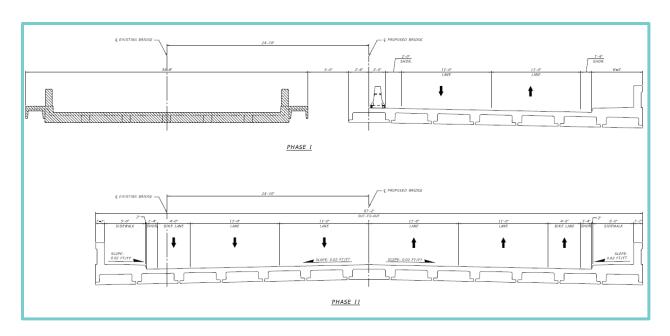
Phased Construction Alternative (Urban Typical Section Only)
